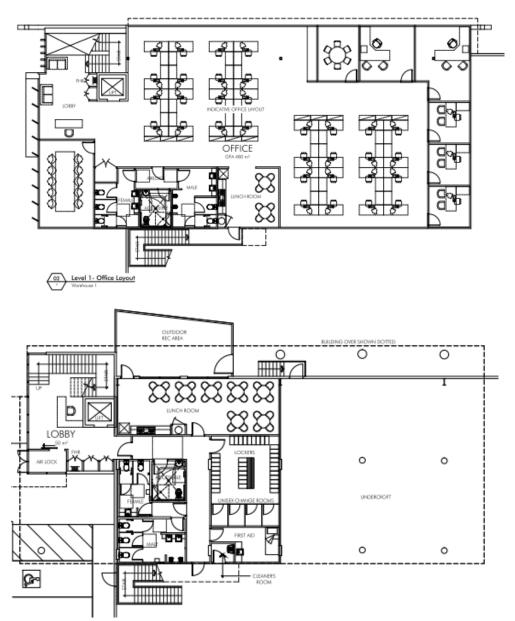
Warehouse 1 - office floor plans on Ground Floor and Level 1
